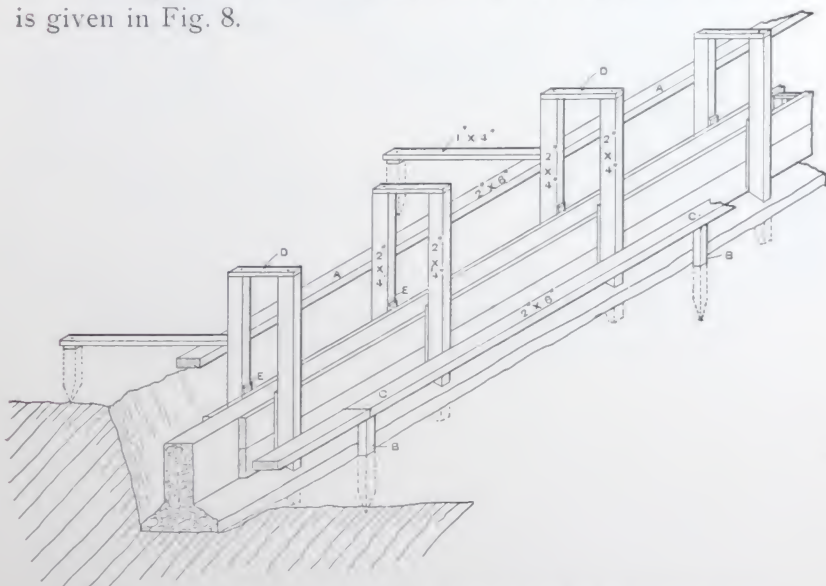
Form for Cellar Wall. (Reproduced by permission from Taylor and Thompson's "Concrete, Plain and Reinforced.")
